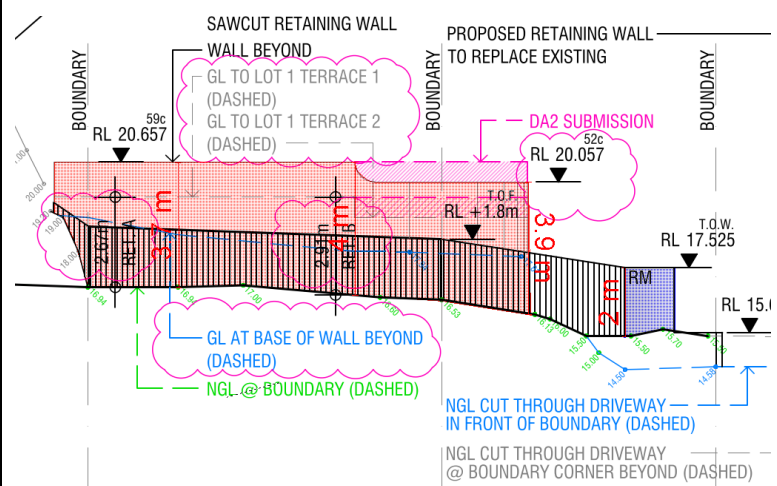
Western Boundary Elevation 1 and Heights of Retaining Walls Marked in Brown and Blue.
